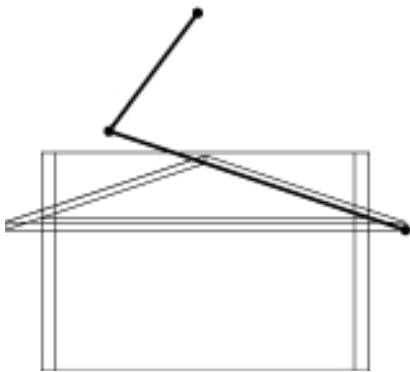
Cut 3D Object - Cut Walls to Roof Line - III
